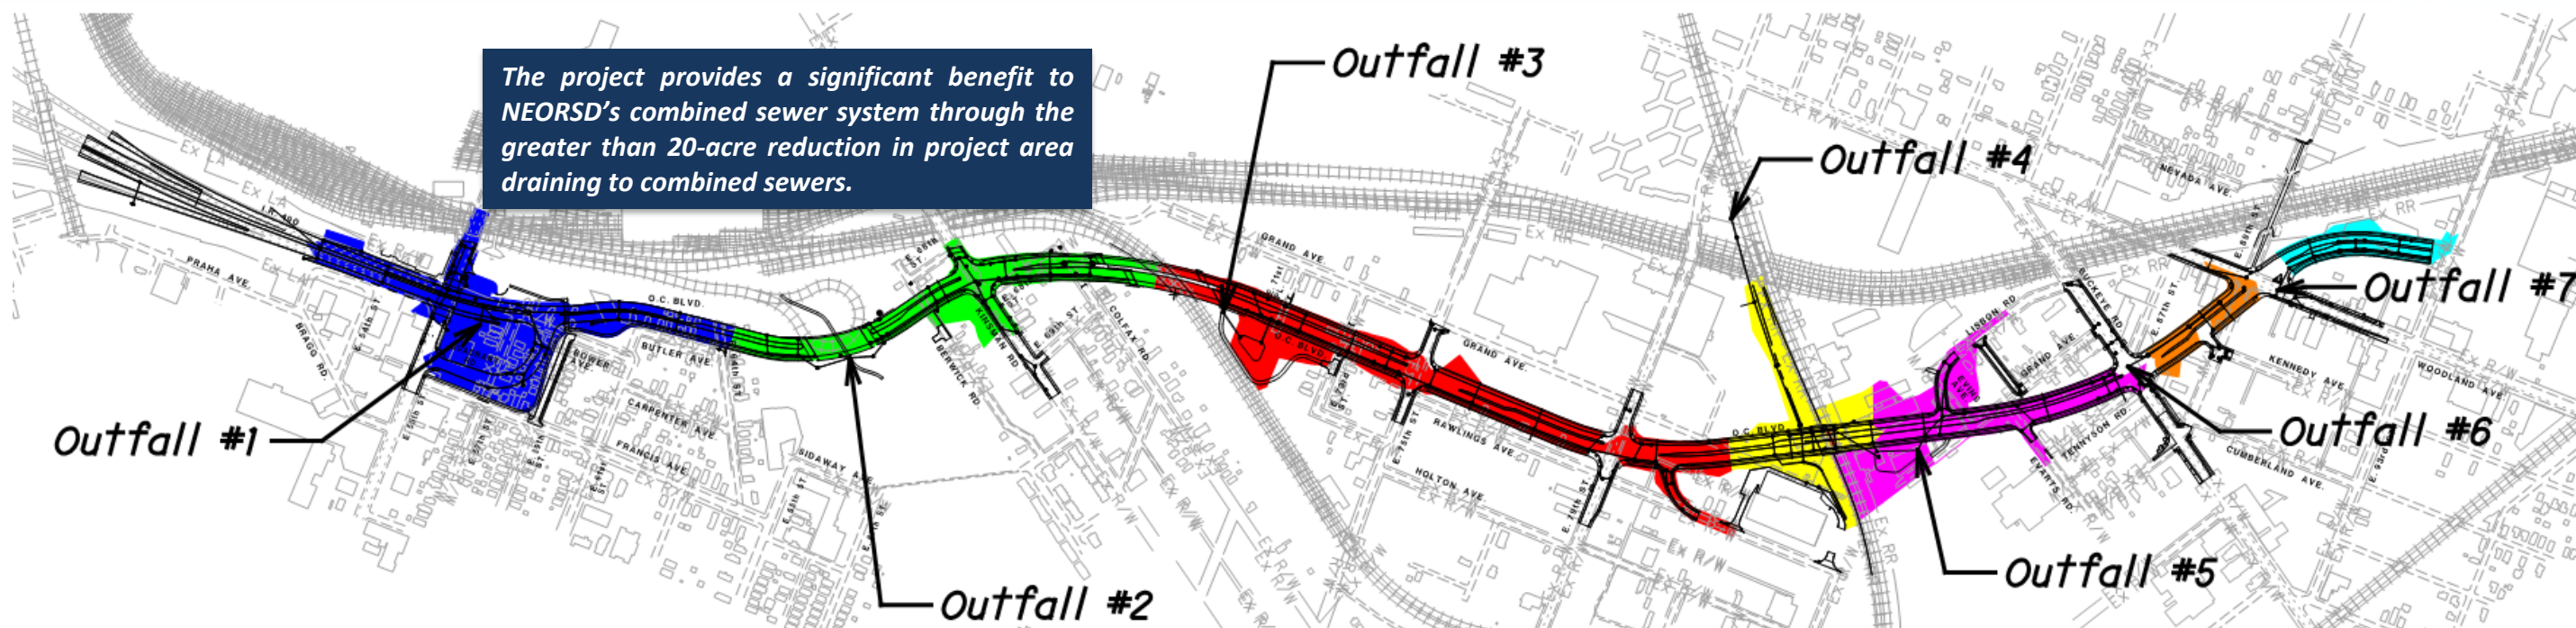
OC3 Stormwater Management Map Showing Drainage Areas and Outfall Locations
